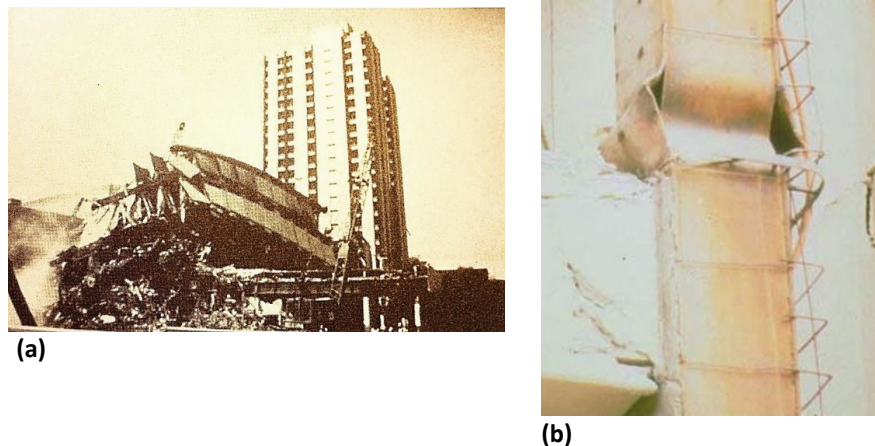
(a) Collapsed building and (b) buckled column of the Pino Suarez building [3]
